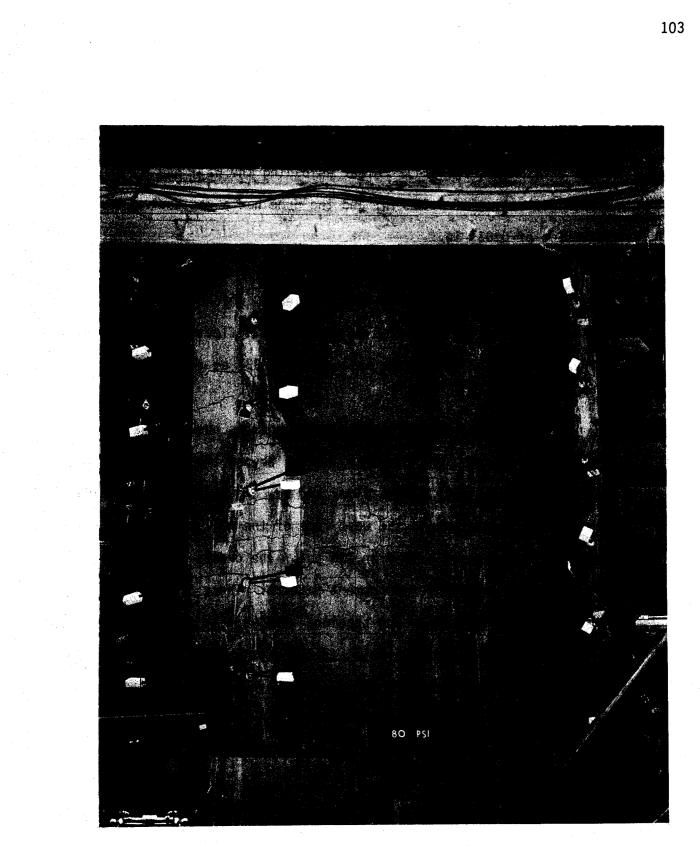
Cracking in West Wall at End of Loading F, 80 psi
